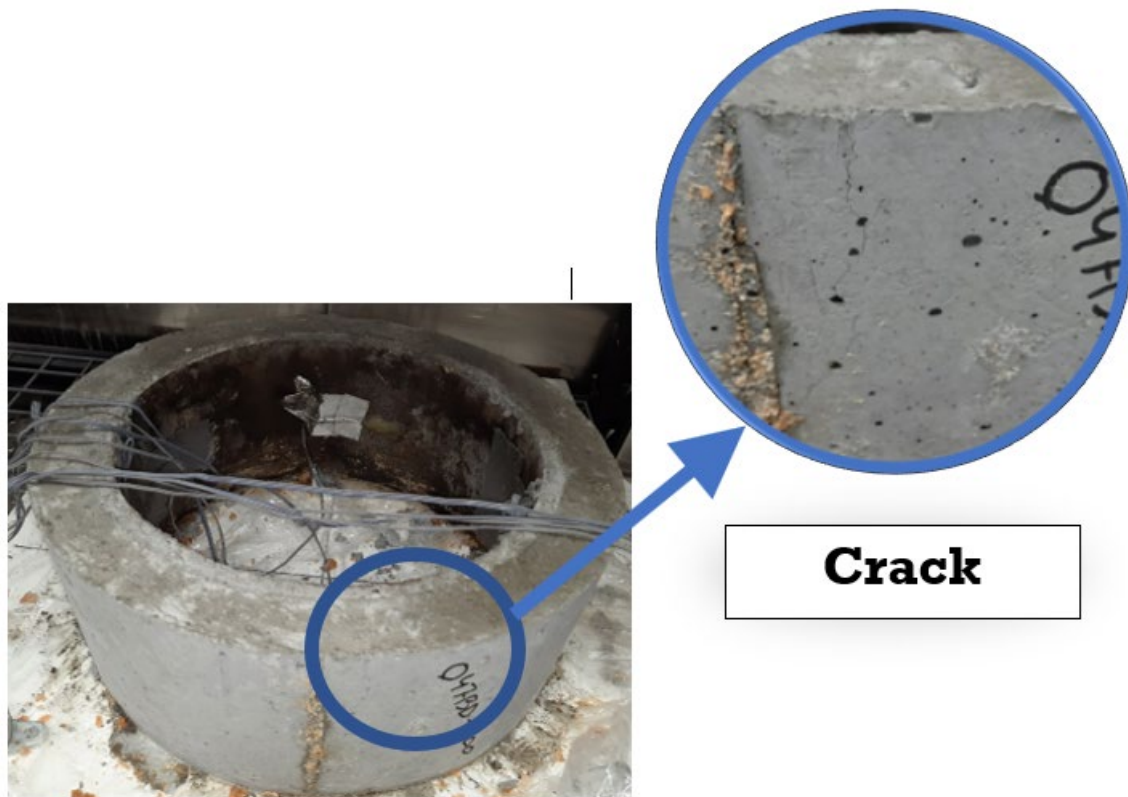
Restrained shrinkage crack in concrete
